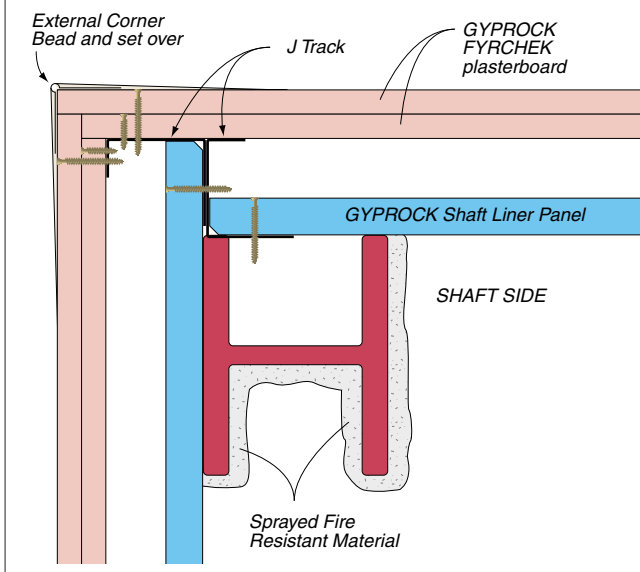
WALL JUNCTION AT UNIVERSAL COLUMN
